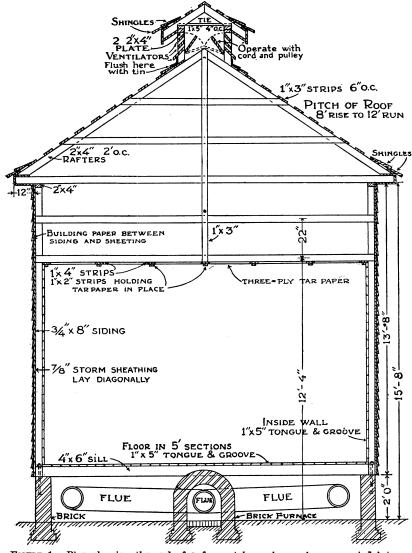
Plan showing the end of a frame tobacco barn when converted into a sweetpotato storage house
